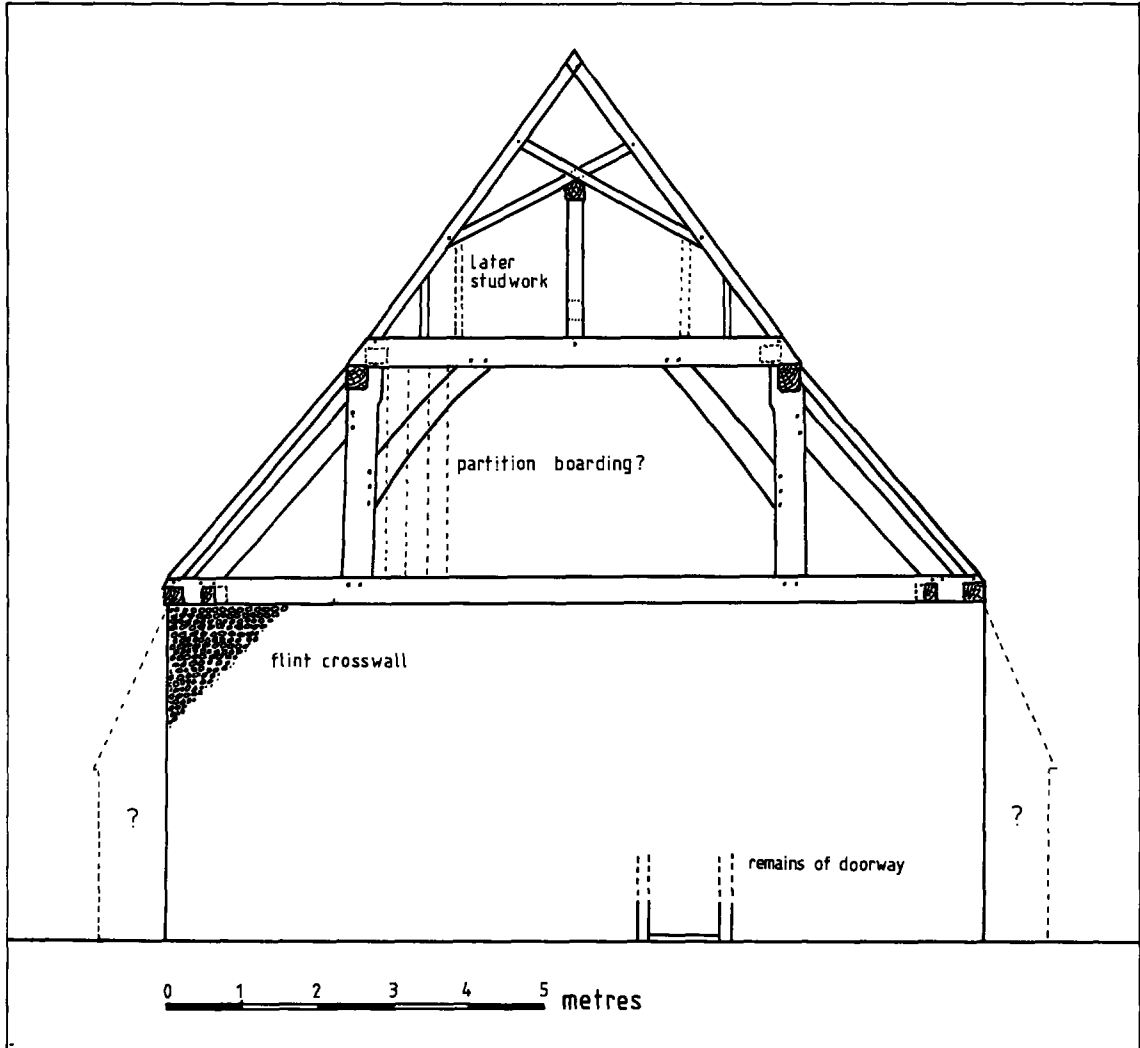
Pilgrims' Hall, Winchester. Cross-wall truss III viewed from north. Scale 1:100.
